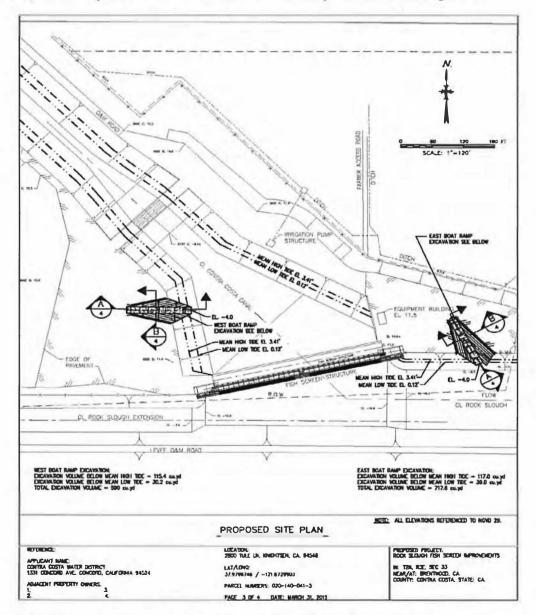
RSFS proposed boat ramp design and site plan (Reclamation 2016).
